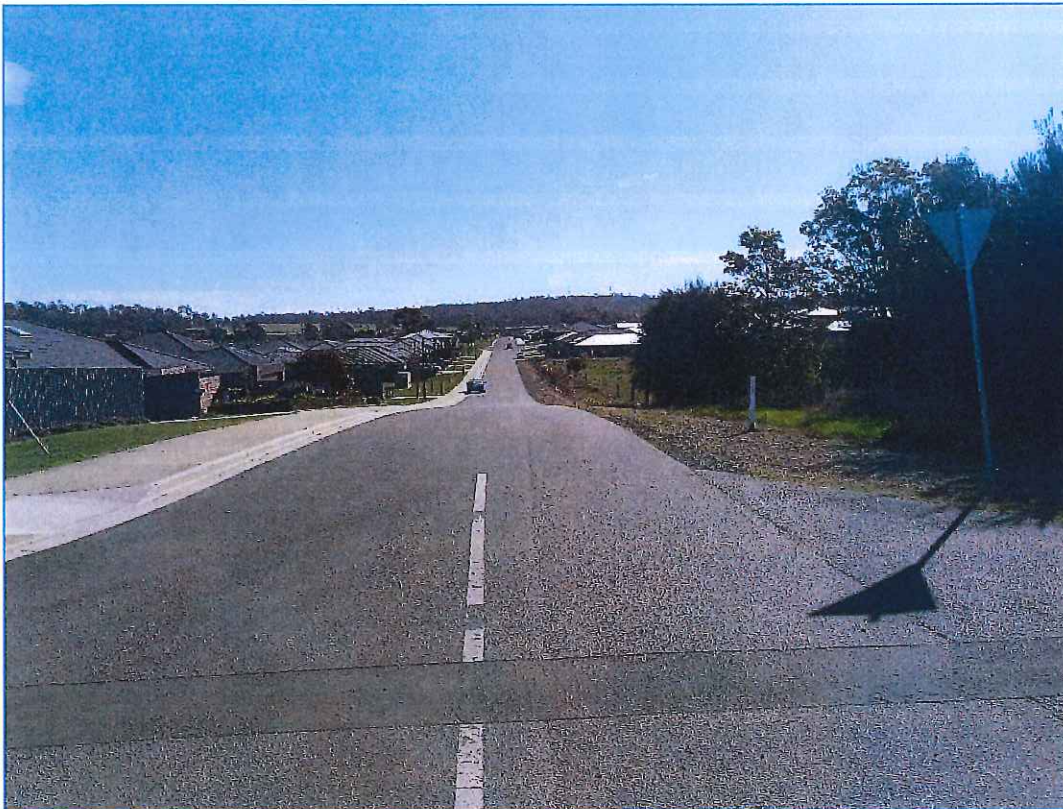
Seccombe Street road frontage from Fairtlough Street intersection
